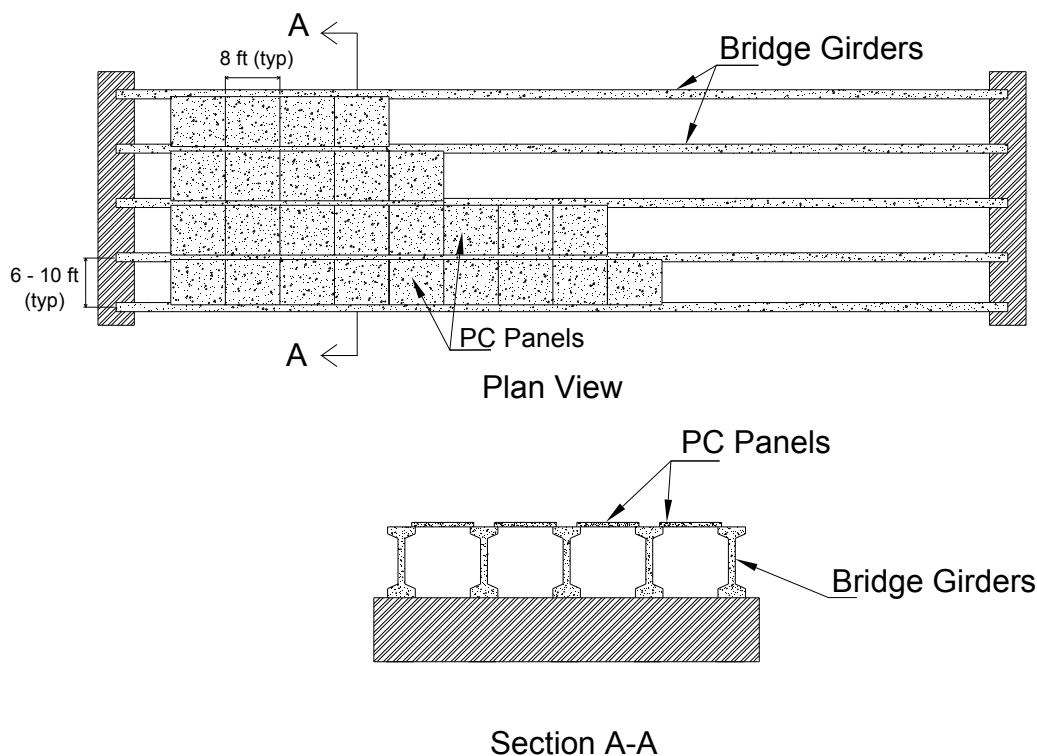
Placement of Precast Panels in Bridge Deck Construction
